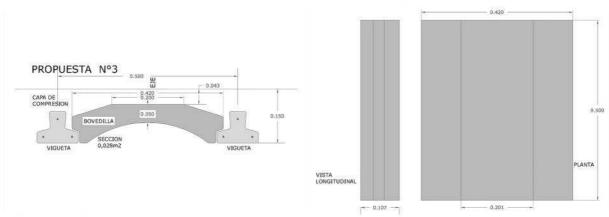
"Plant, view longitudinal and section of the proposal N°3"
